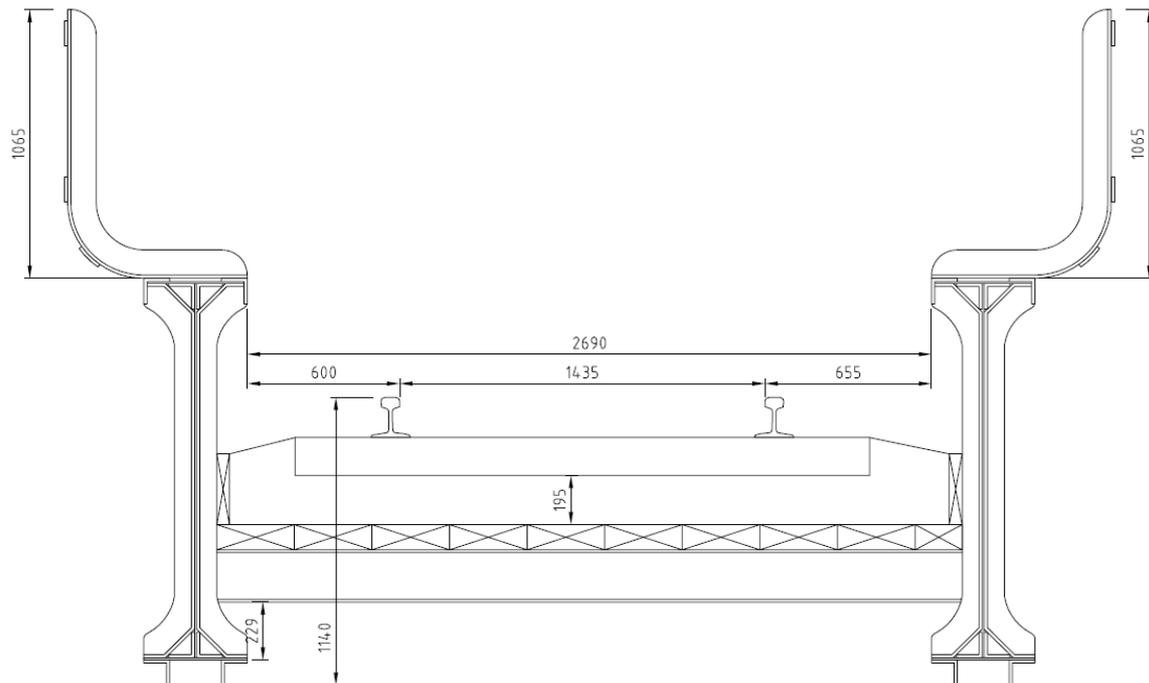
Typical U-frame type steel railway bridge for ballasted track
